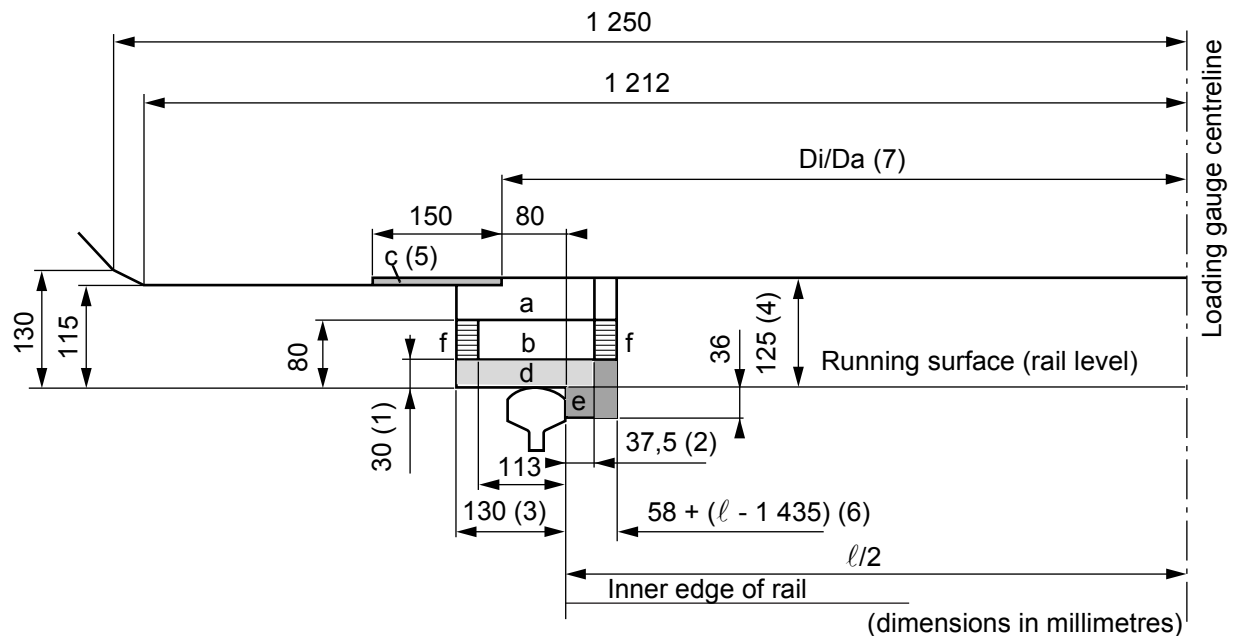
Loading gauge of the kinematic loading gauge for the lower parts of the wagon
